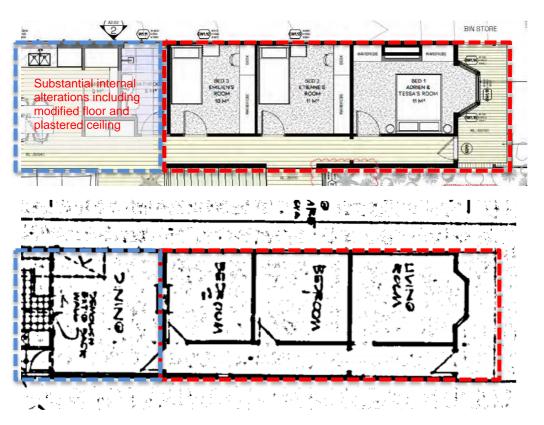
Proposed ground floor (top) showing the retention of significant three front bedrooms and most of the south wall (red hatching). The blue area shows the altered dining room and additional kitchen.
